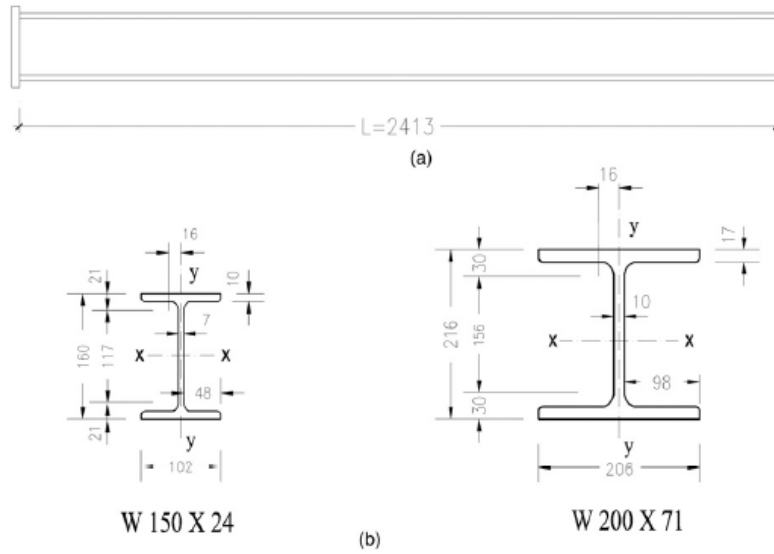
Cross Section of The Test Specimens (dimensions are in millimeters)
